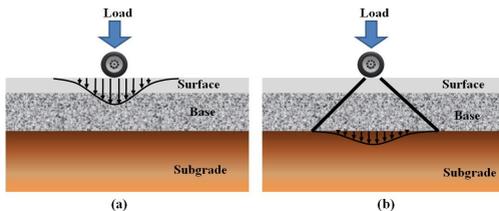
Stress distributions with depth in a flexible pavement (a) high stress area directly under wheel load; (b) reduced load at subgrade level
